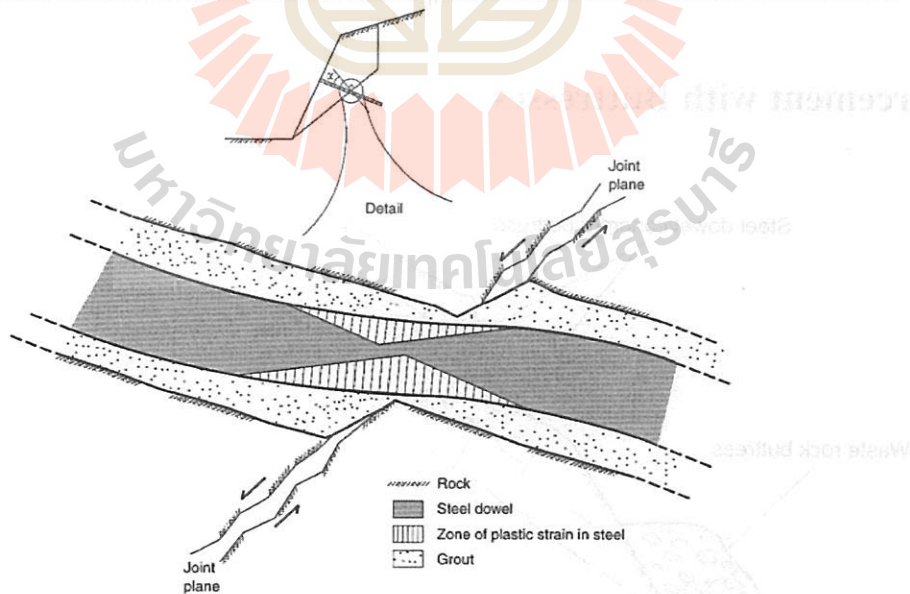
Strain in fully grouted steel dowel due to shear movement along joint (modified from Spang and Egger (1990)).
